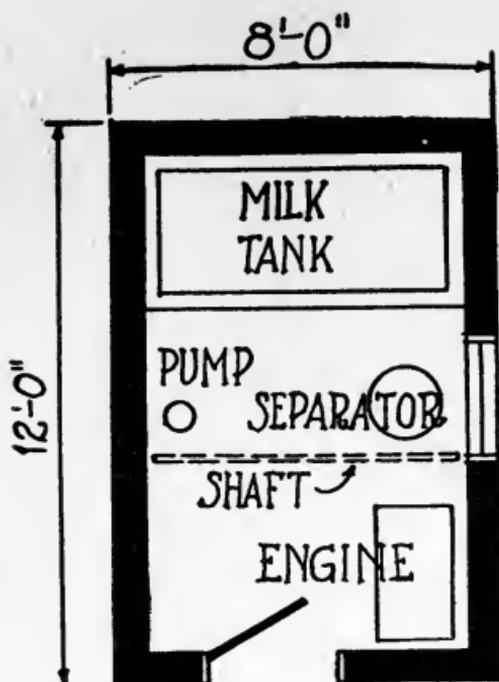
Floor Plan of Concrete Dairy Tank House, 8 Feet by 12 Feet
